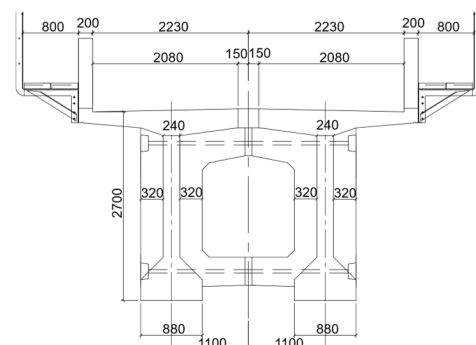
Dimension of the cross-section of T-shaped beam bridge (unit: mm)
